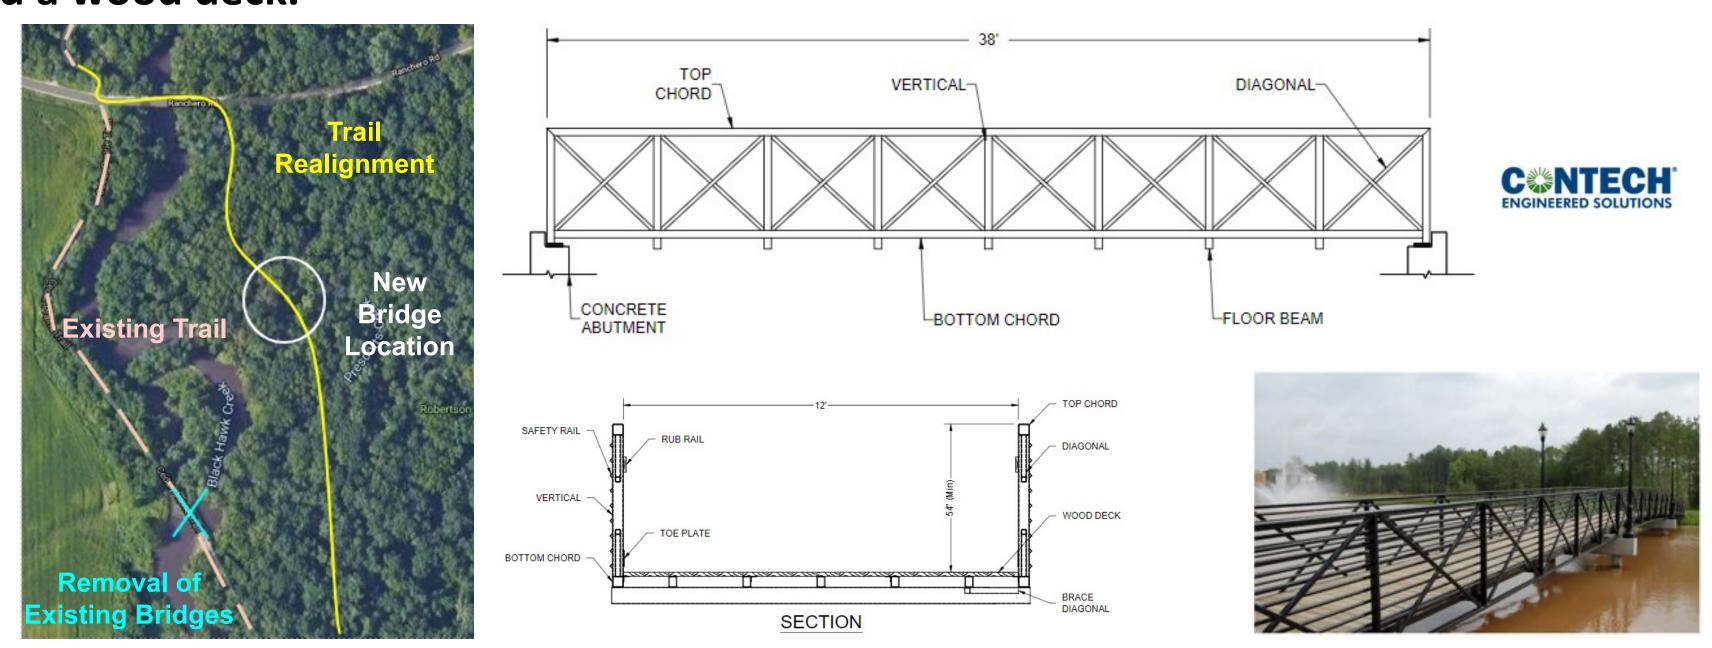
Design plan for Western Bridge Alternative including the alignment and bridge design.
